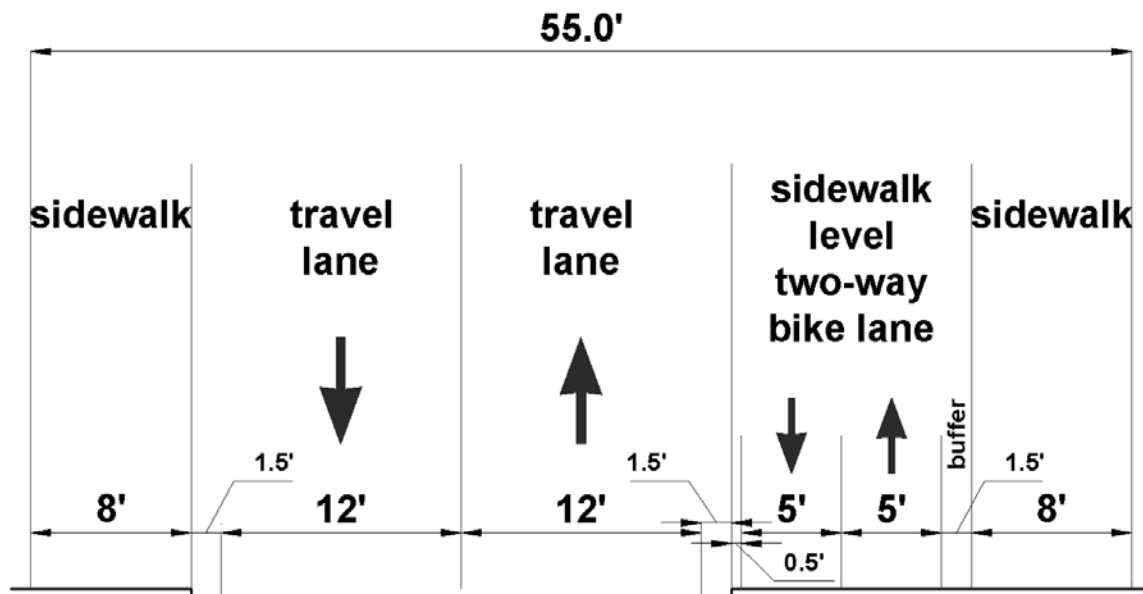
Recommended Cross-Section for the Burgard Bridge.
